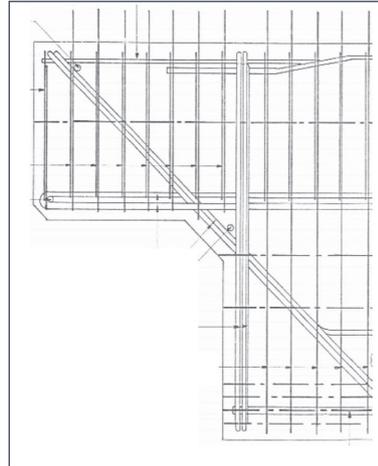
Cross-sectional detail of steel reinforcement arrangement within the half-joint
